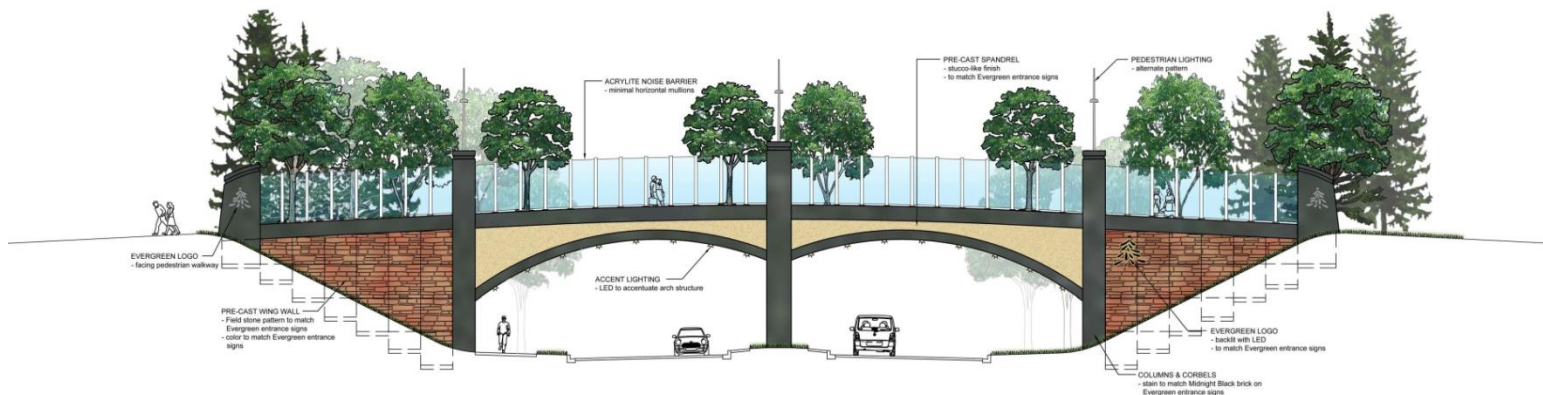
ELEVATION VIEW RENDERING OF GREEN BRIDGE
